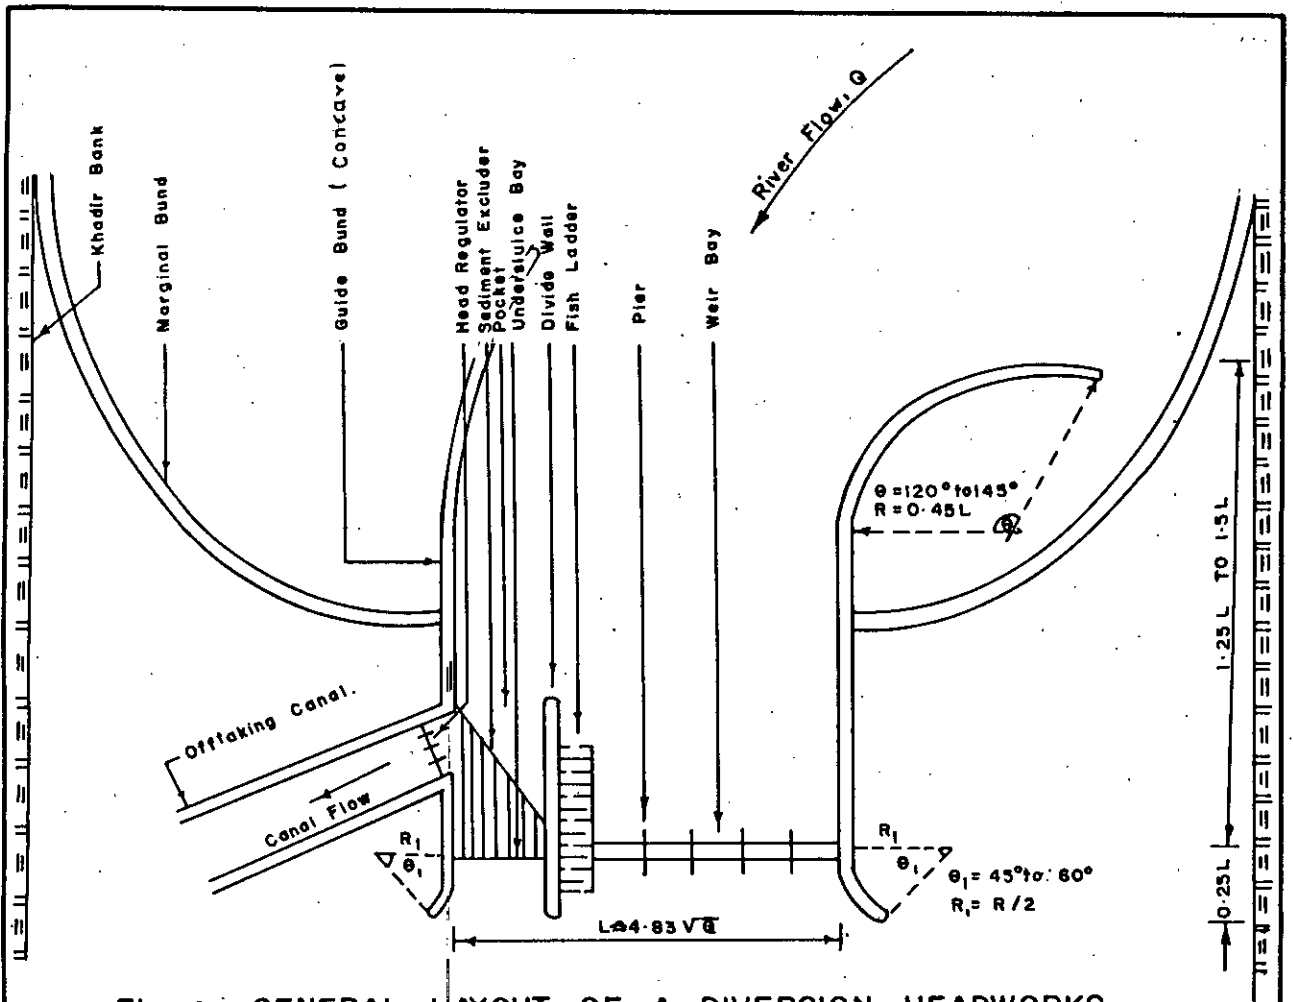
GENERAL LAYOUT OF A DIVERSION HEADWORKS
